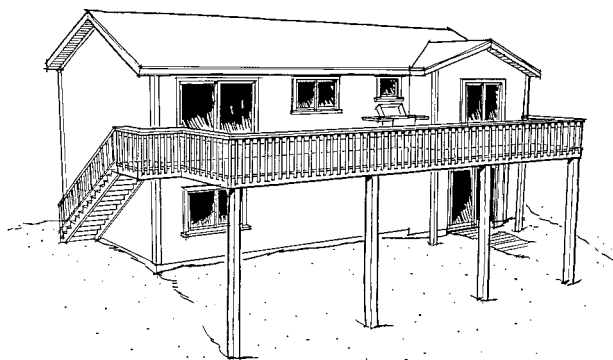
The original deck design for this house overlooking Puget Sound not only failed to connect the house to the surrounding landscape, it also obscured views from the house and blocked light from the walkout basement.
